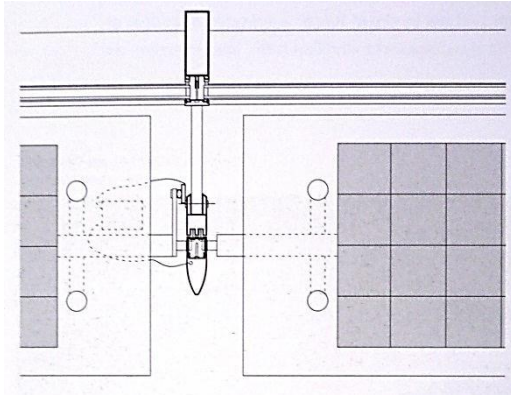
Plan section of the extension of Goethe School in Essen, Germany (Lüling, 2009).
